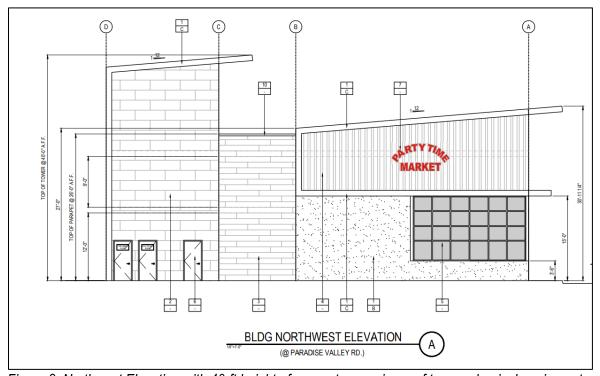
Northwest Elevation with 40-ft height of parapet screening roof top mechanical equipment
